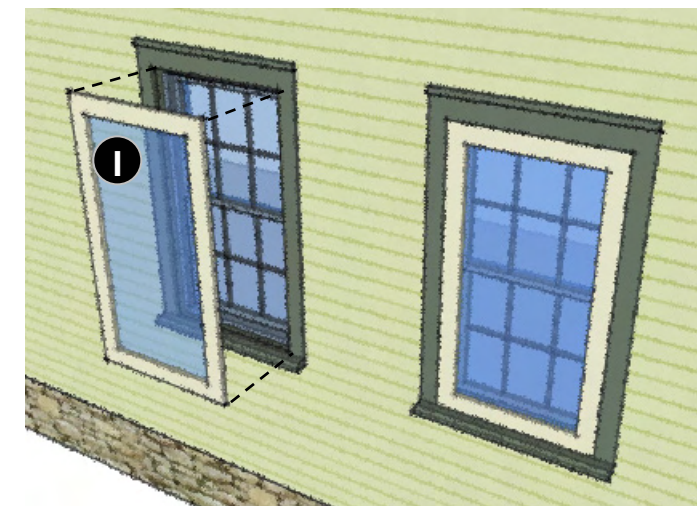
Example of proper storm window design and installation. Storm windows constructed of wood or vinyl should always be mounted so they are recessed into the frame of the wood window trim, and not attached directly to the face. Wood storm windows are generally preferred, but vinyl or aluminum can be used if they have a painted finish.
